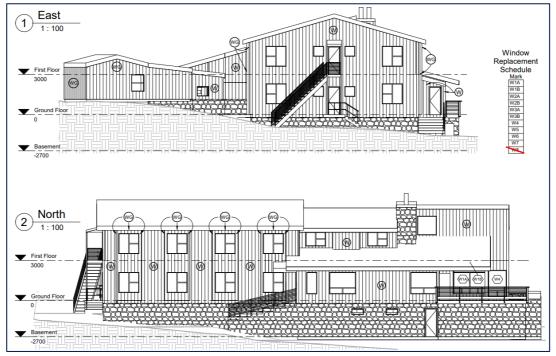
| Proposed works east and north elevations (Source: Applicant's documentation with annotation)
